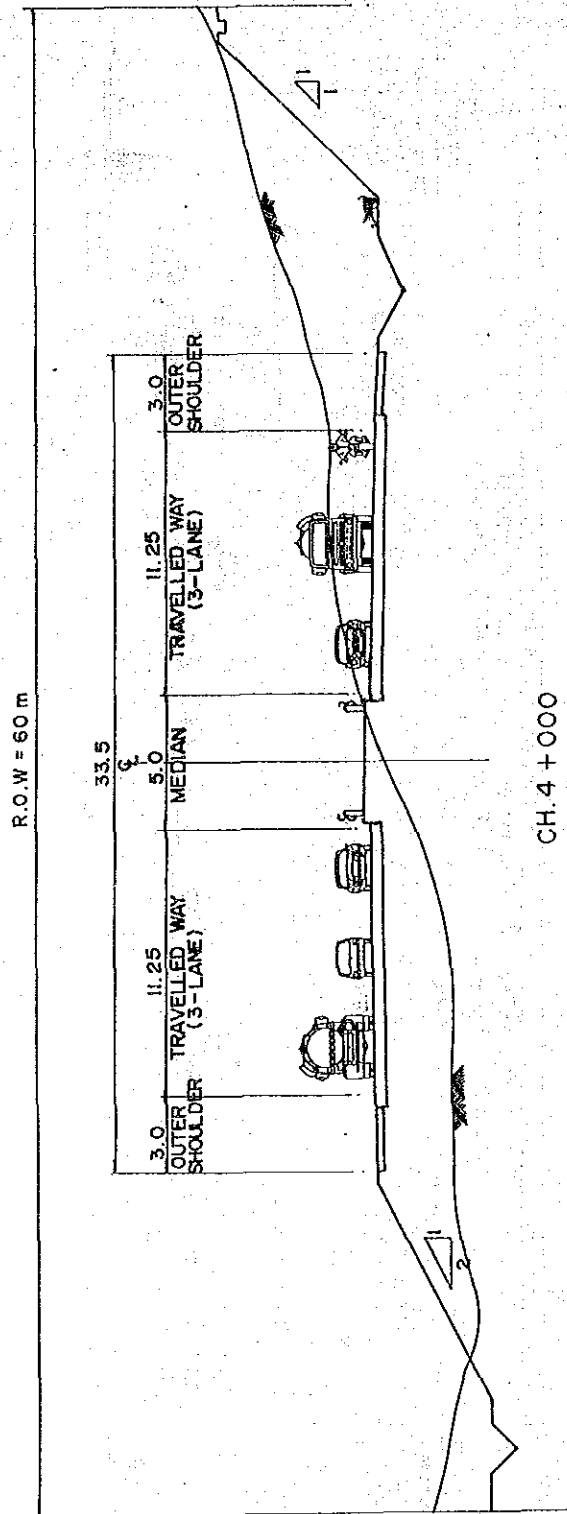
TYPICAL CROSS-SECTION FOR 6-LANE SCHEME
